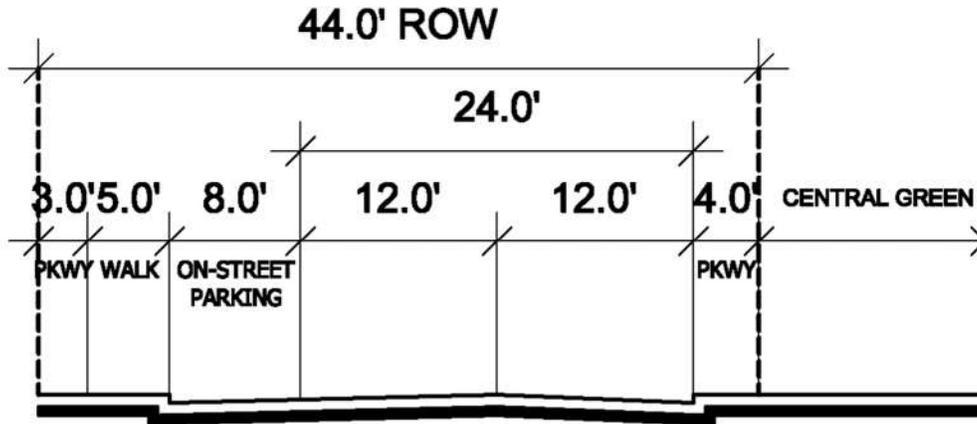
CENTRAL ENTRY DRIVE (Std. 107)
